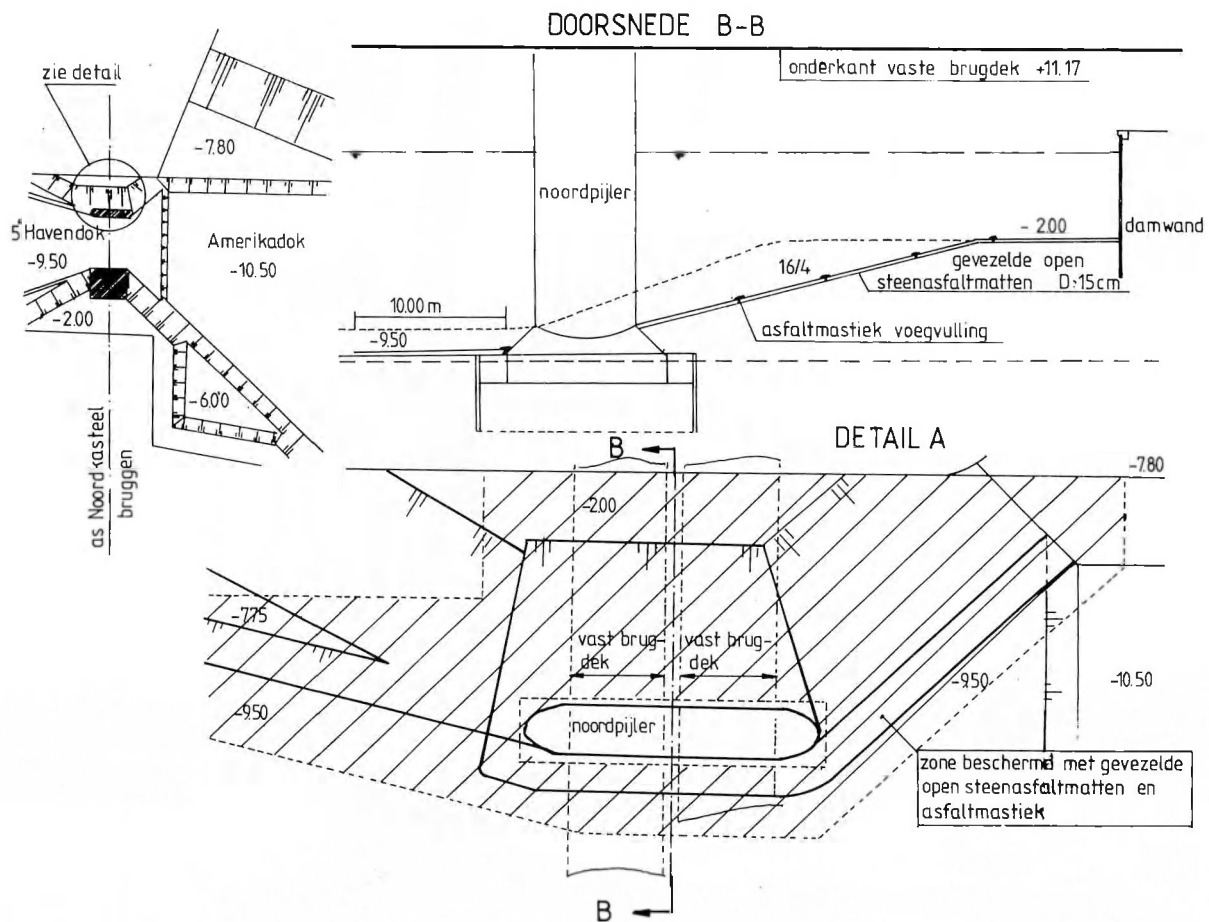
Location of the bottom improvement works north of the Noordkasteel bridges.
